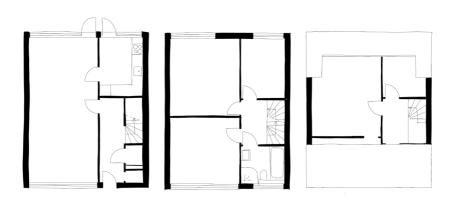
Schematic floor plan of Mr and Mrs Vissers terraced house
